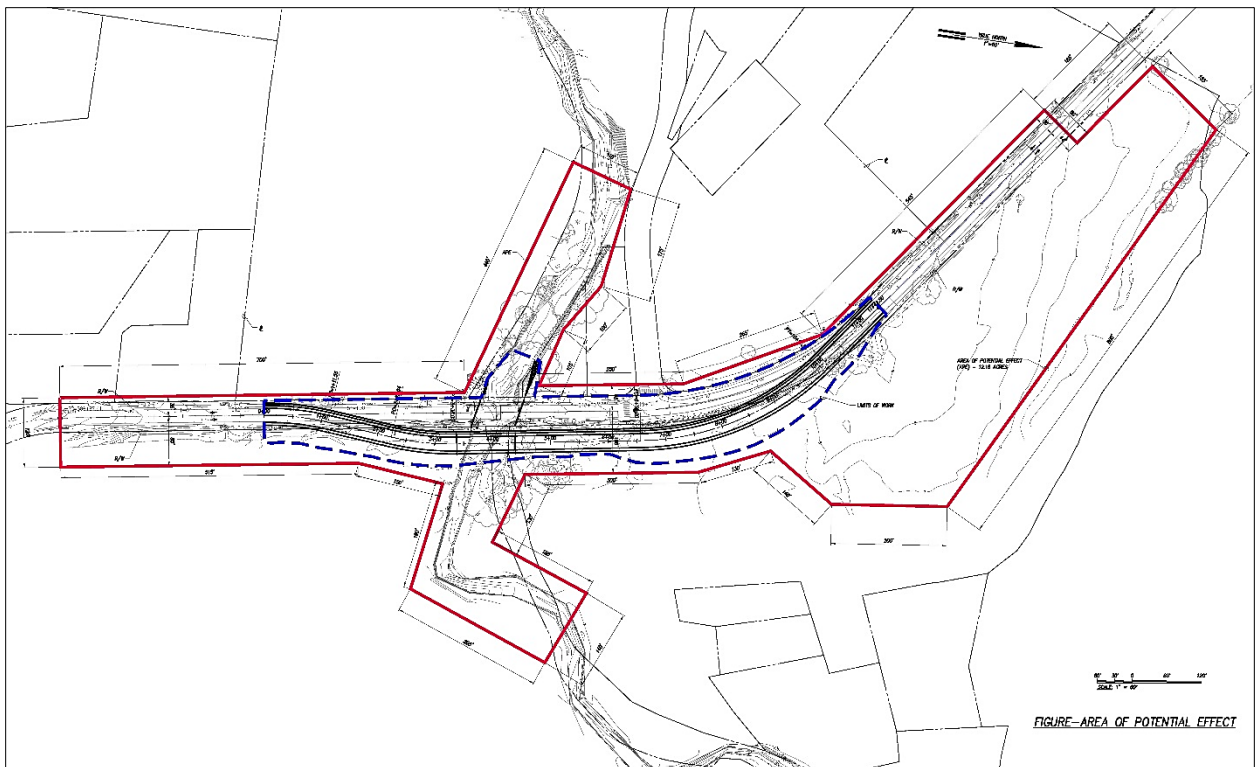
Proposed Waiāhole Bridge Replacement Project plan showing study area outlined in red.
